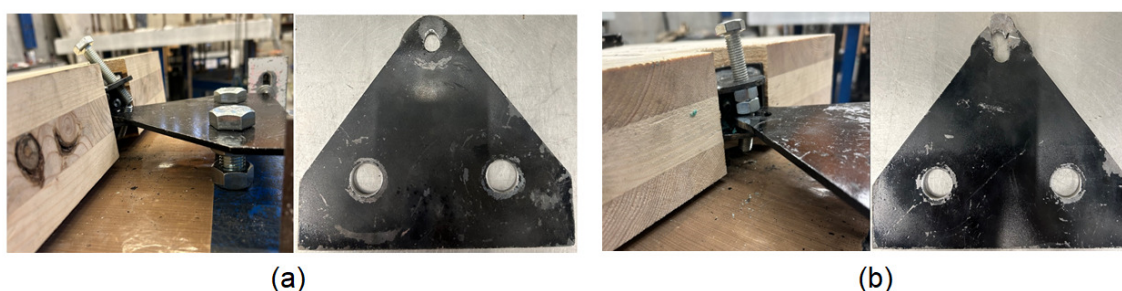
Failure in the connector; (a) M12 bolt with no nuts, (b) M12 bolt with nuts
